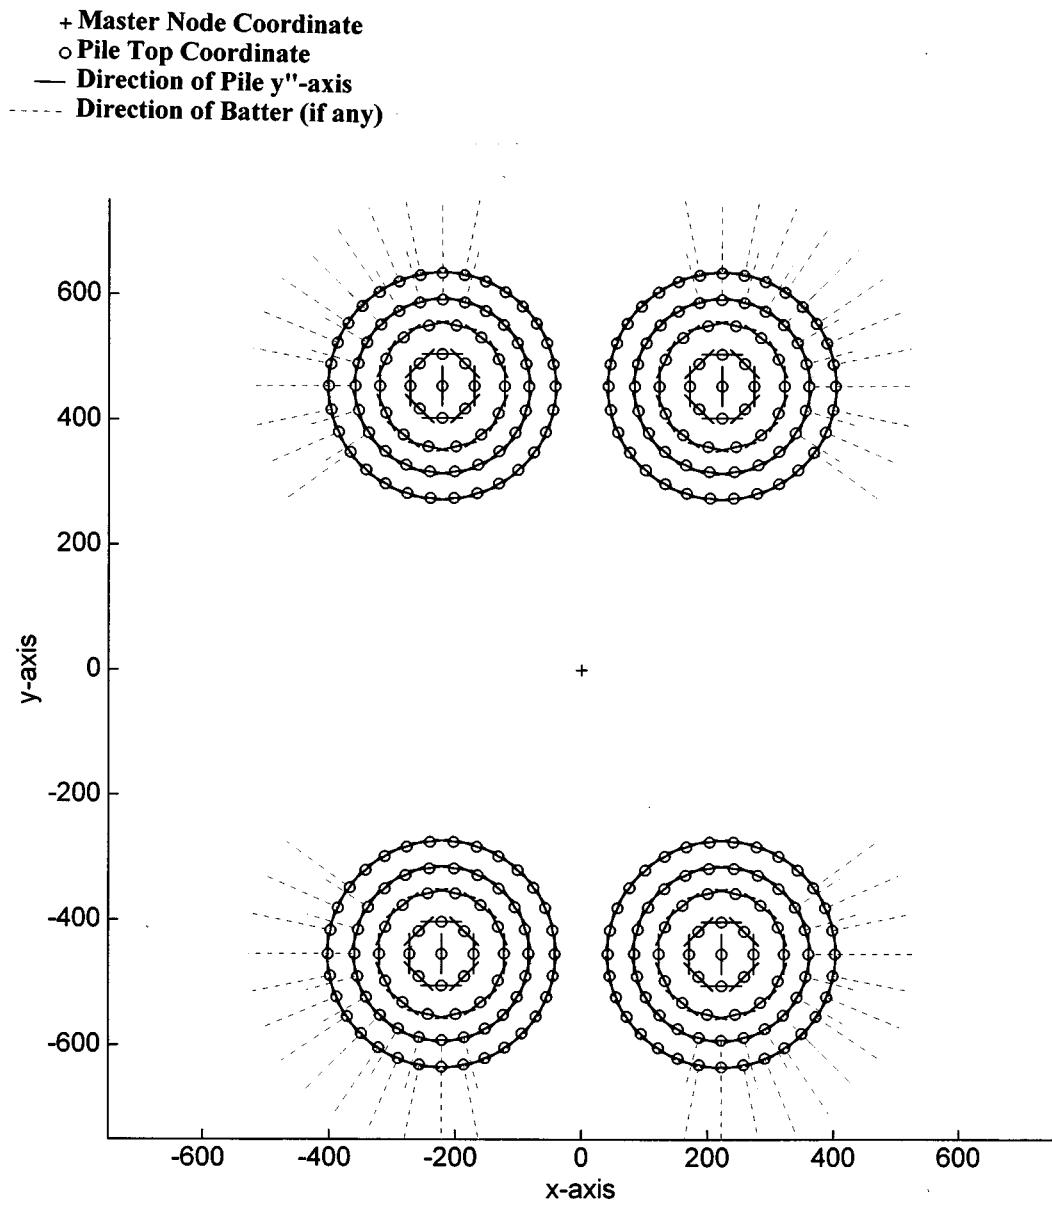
Plan view of pile group layout at Richmond-San Rafael Bridge.
